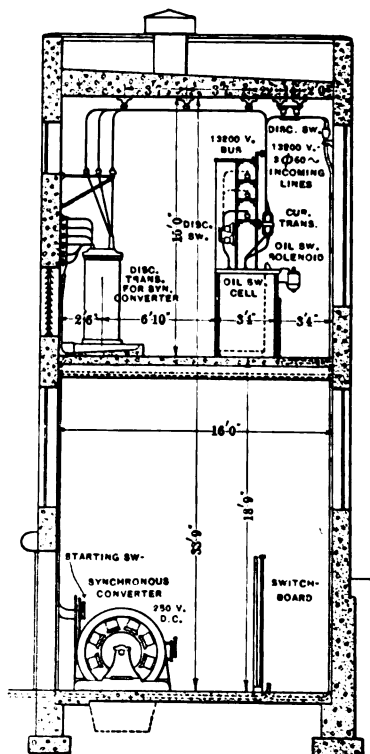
SECTIONAL VIEW OF PLANT No. 5
